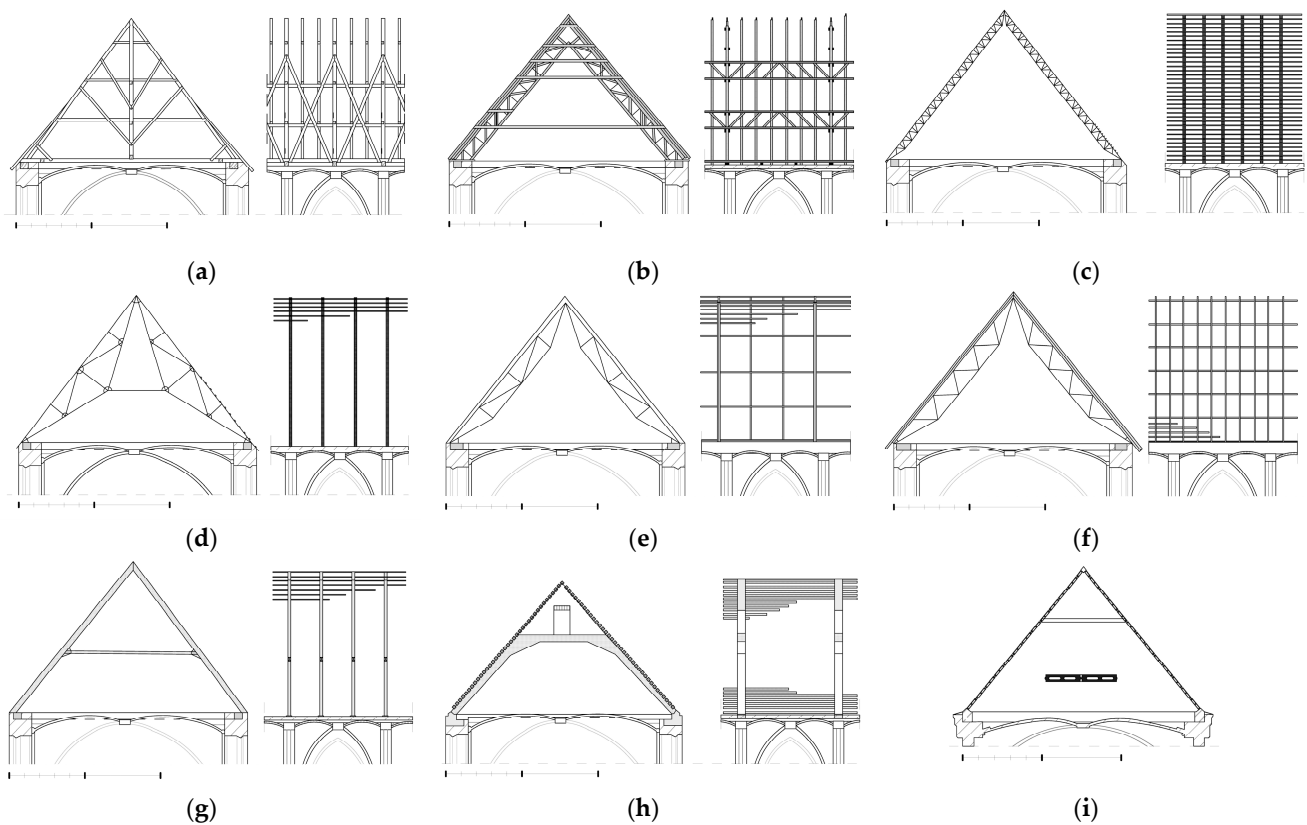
Lübeck cathedral roof structure: (a–h) reconstruction variants; (i) built version.
